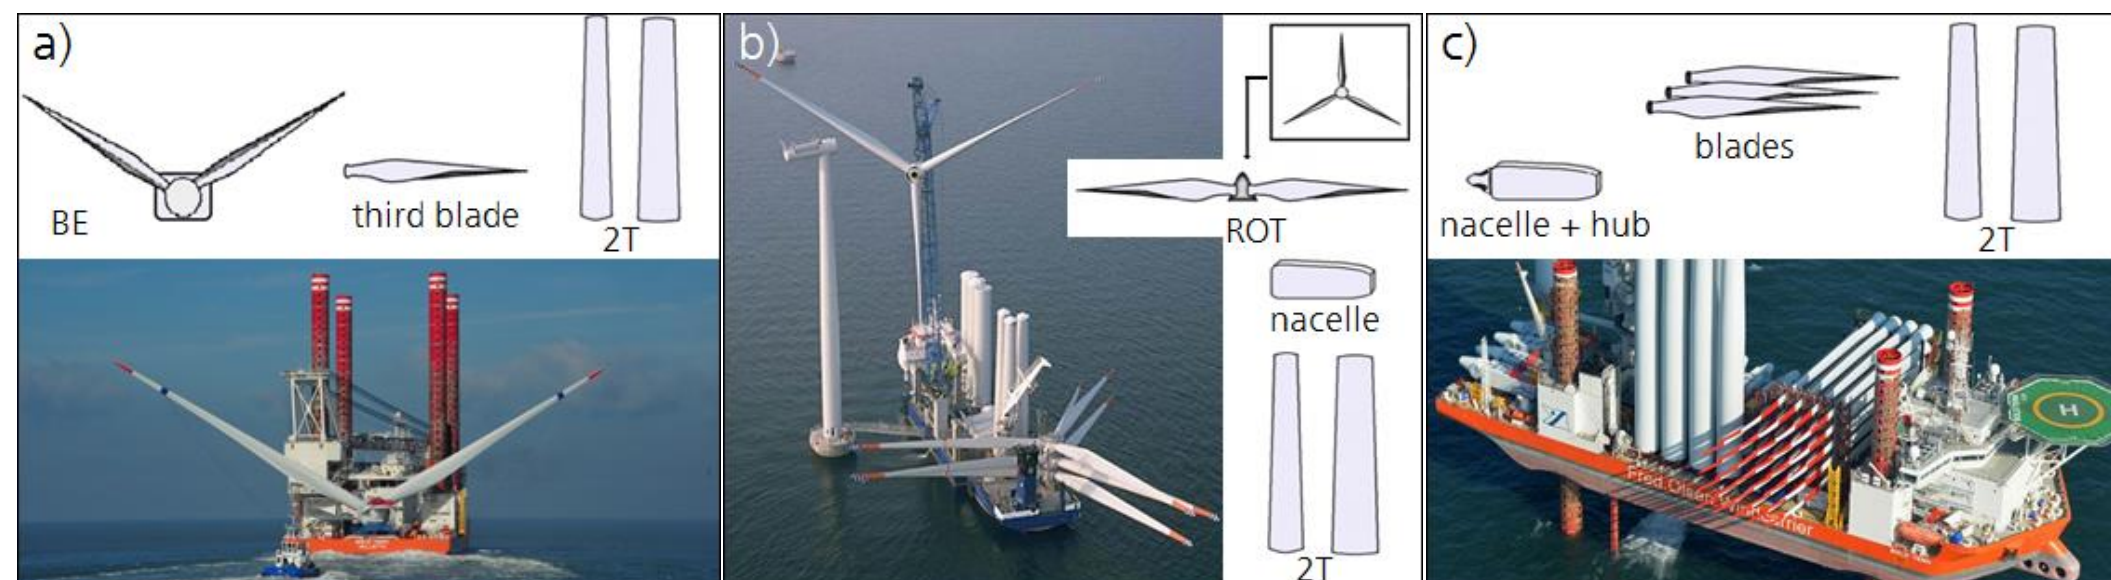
Pre-assembly methods: (a) Bunny-ear [1,2], (b) Rotor star [1,3], (c) Single pieces [1,2].
